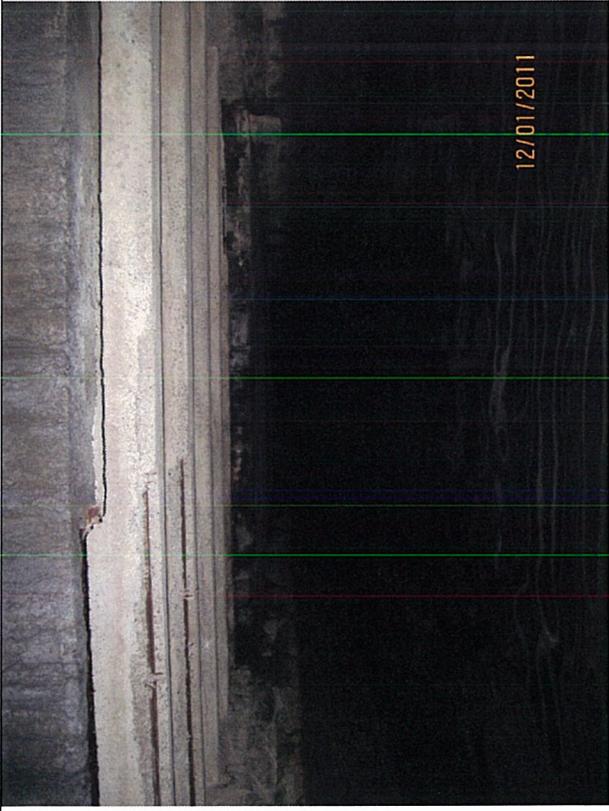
Looking north through BC1255 (culvert between Fleet St. and Lancaster St.)
